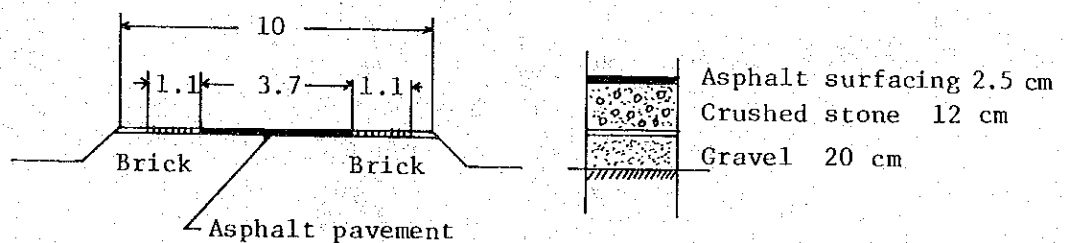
Standard Cross Section of the East-West Highway (in m.)
